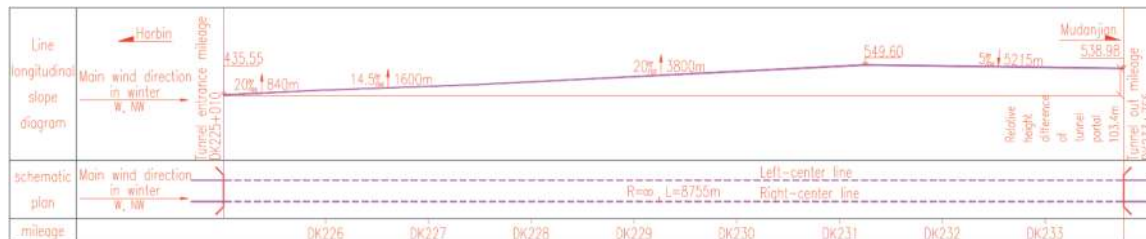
Schematic diagram of the plan and longitudinal section elements of Hufengling Tunnel on Harbin-Mudanjiang railway.
